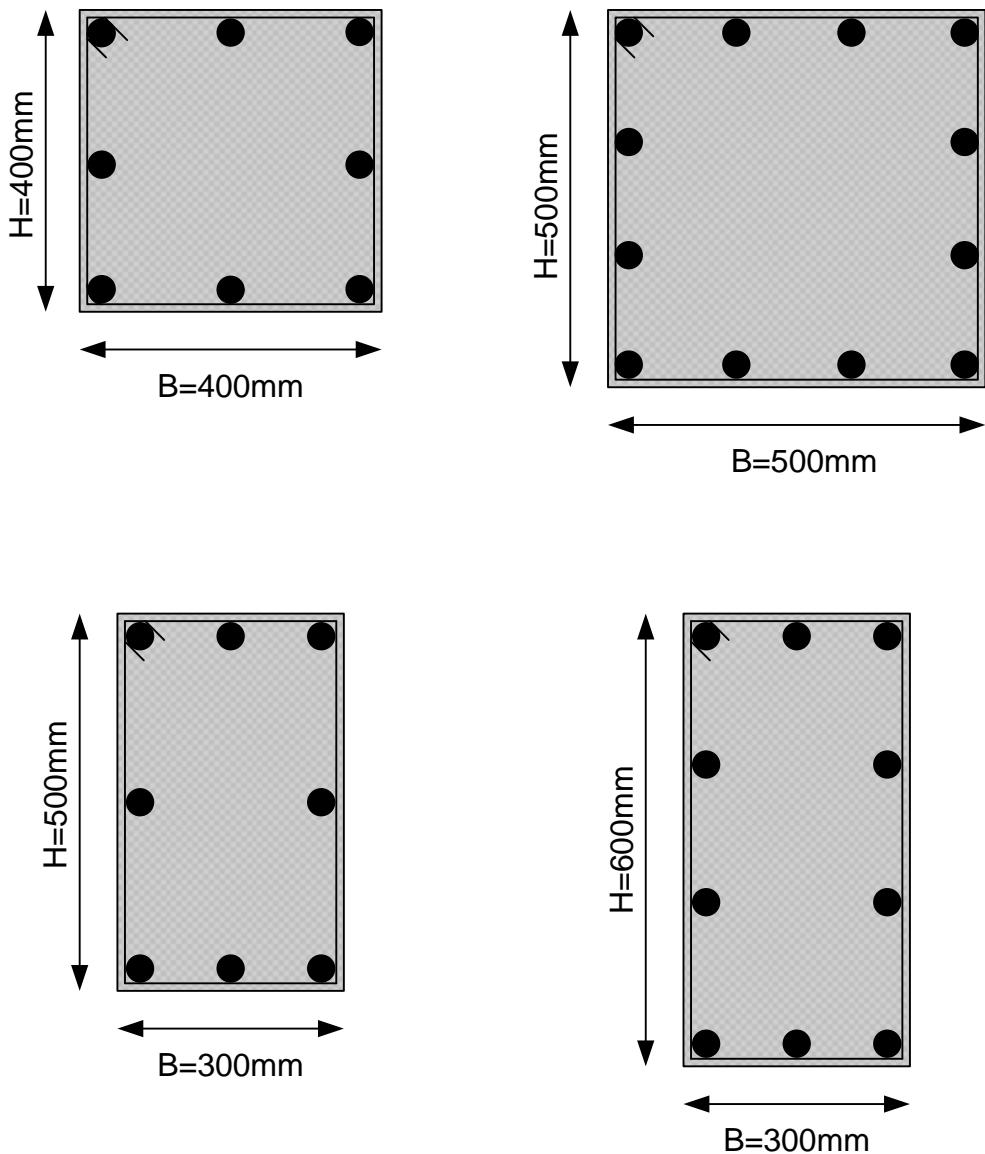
Geometric Properties and Detailing of the Reinforcement of the Columns Selected for Parametric Study
